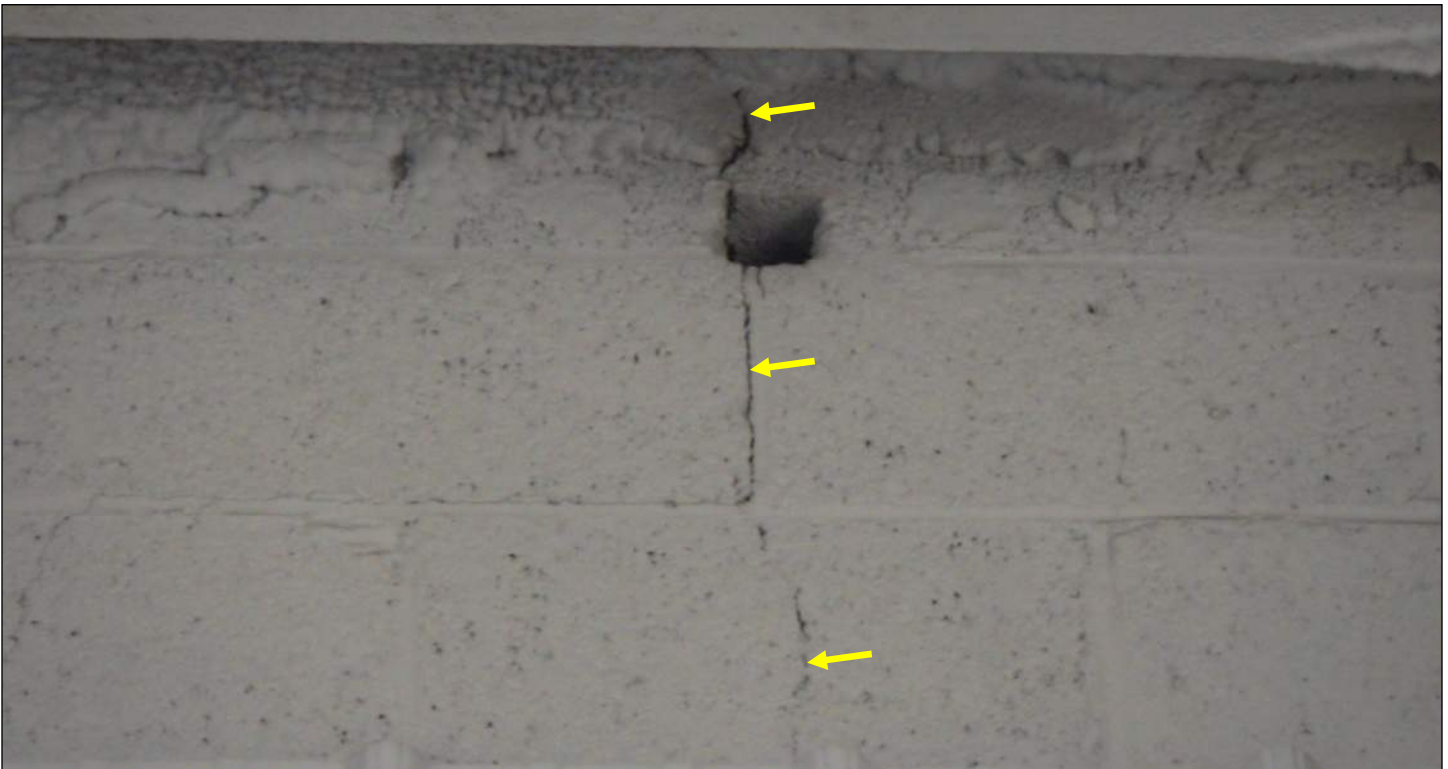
Closeup of crack shown in previous photo. Note rounded edges of CMU along crack and paint within crack.
